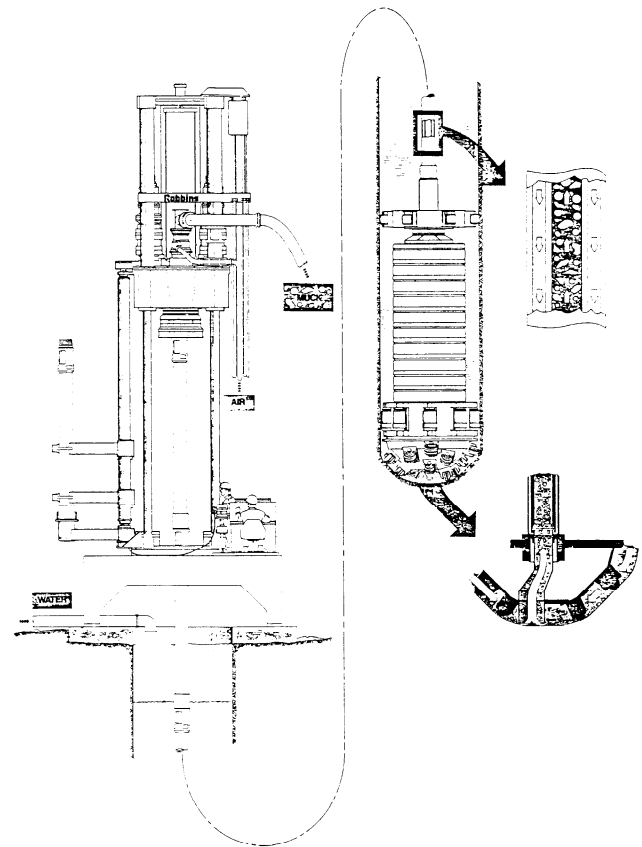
Blind hole drilling rig (courtesy; Robbins Co.).
